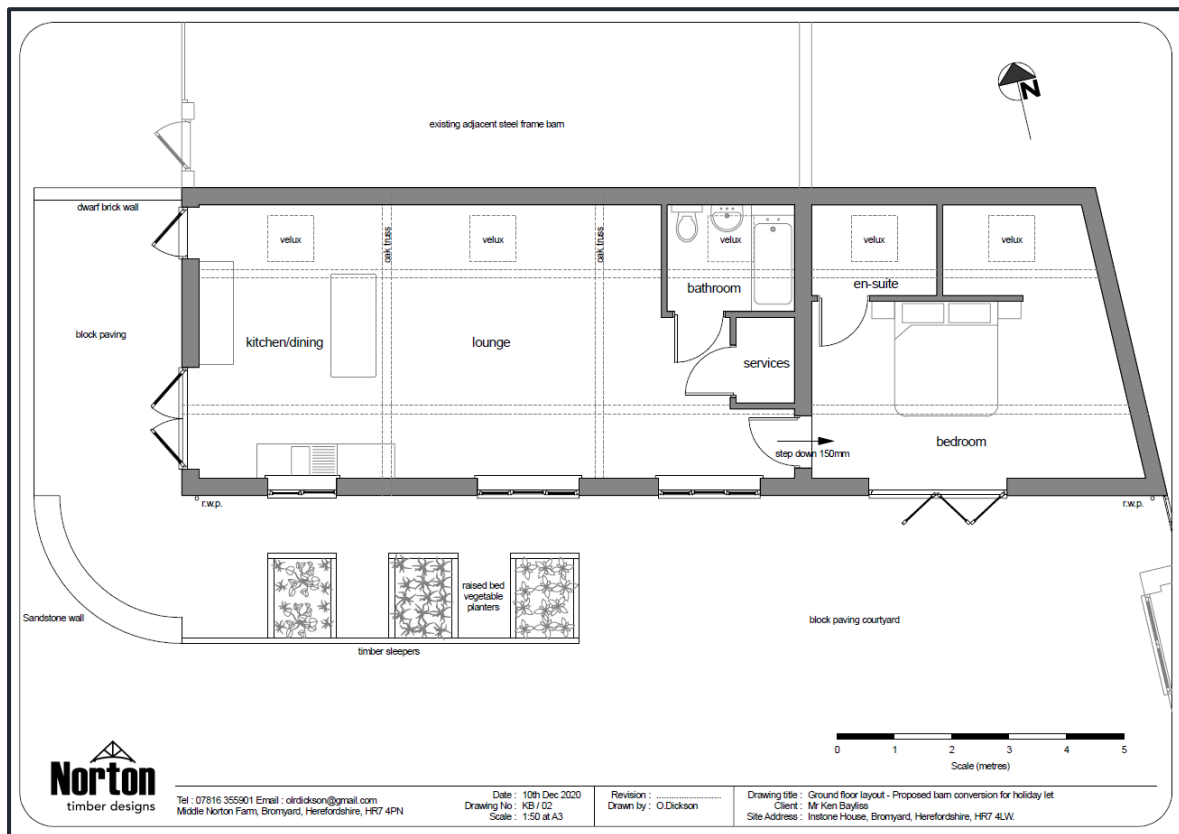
(ii) Ground Floor layout for barn conversion for holiday let (not to scale)
